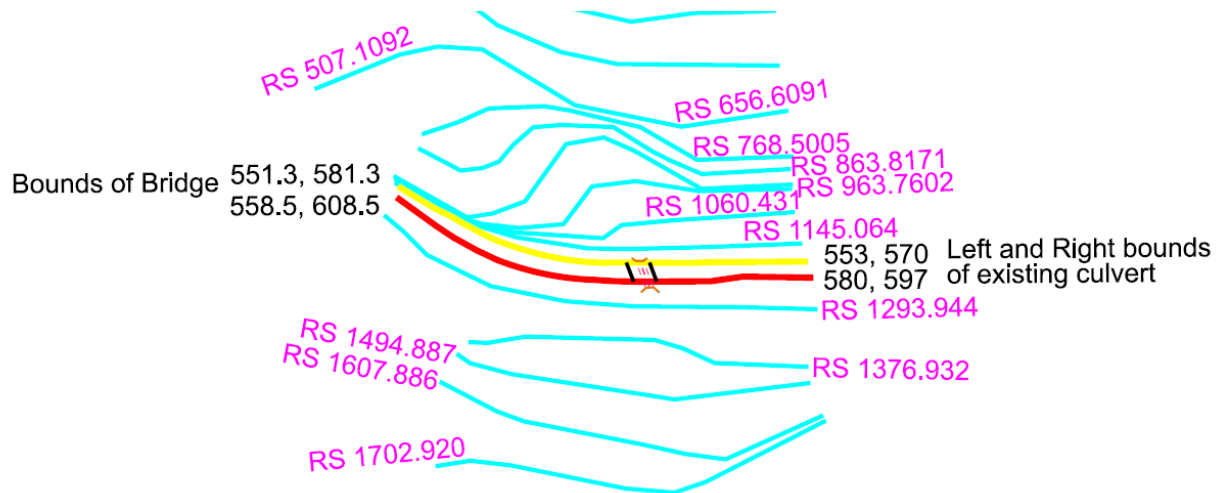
Outline of Bridge Placement Relative to Roadway Stations in OpenRoads
